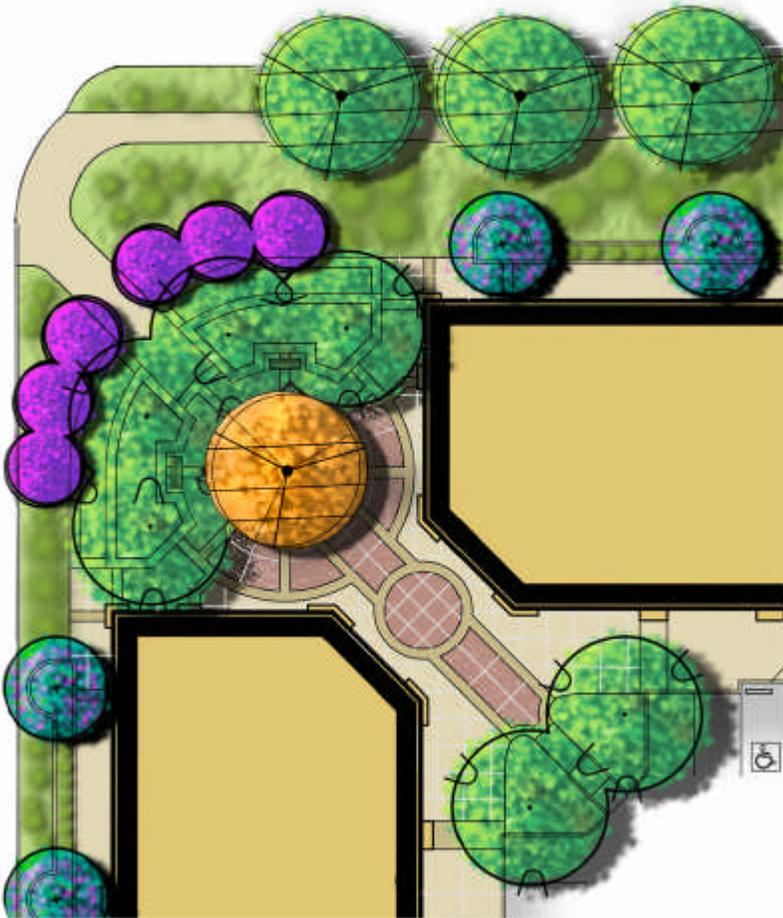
Rendered Plan View of Typical Plaza
